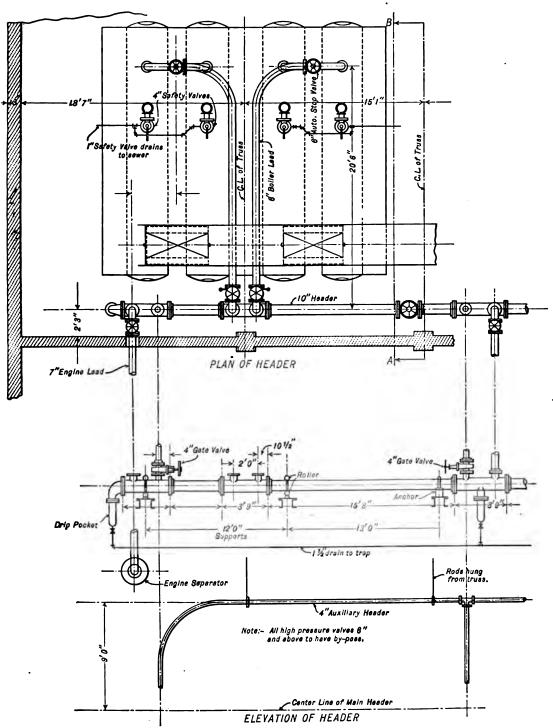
PLAN AND ELEVATION OF SINGLE-HEADER SYSTEM.
